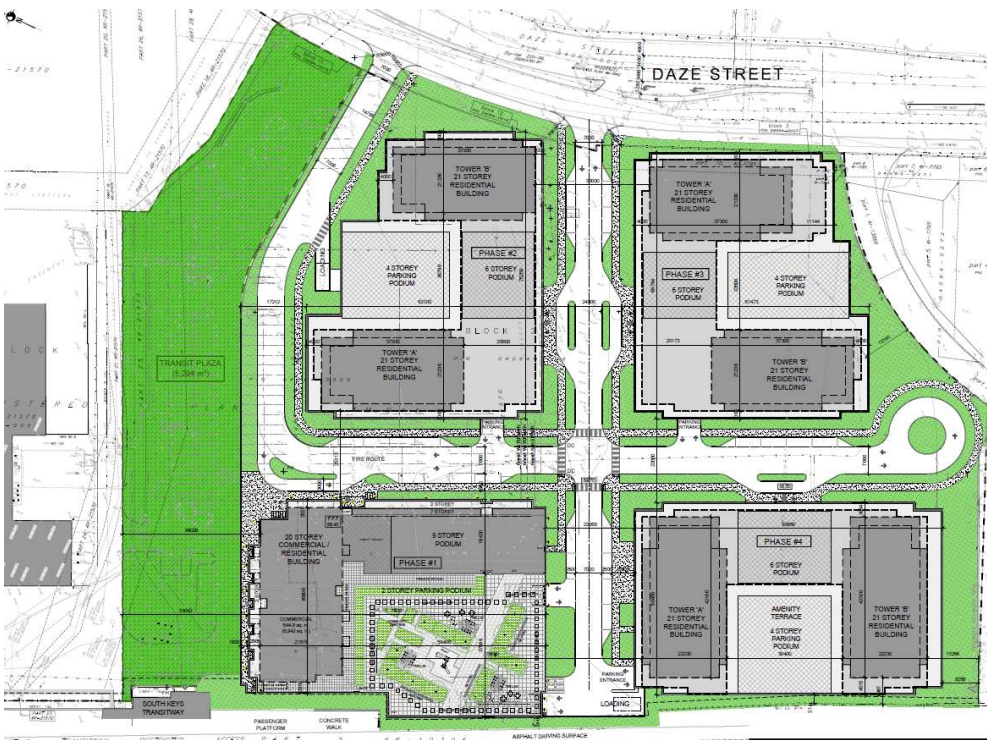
Site Plan excerpt displaying the conceptual build-out of the South Phase (RLA Architecture)
